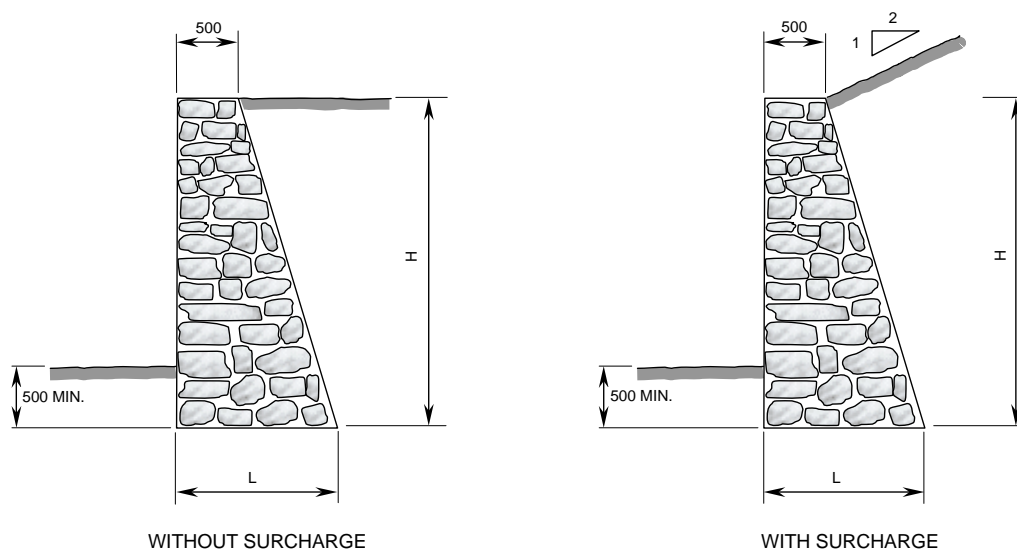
Stone, brick or blockwork wall with and without sloping backfill (surcharge)
